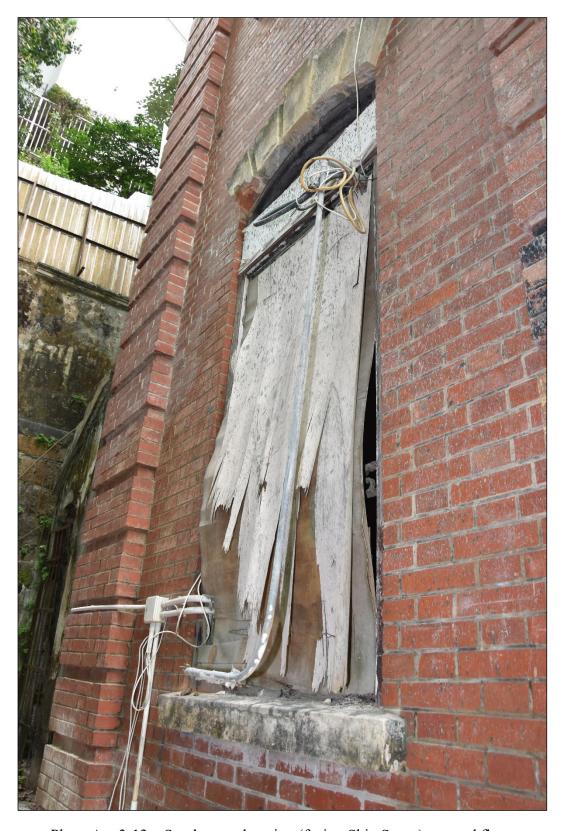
South-east elevation (facing Ship Street), ground floor, window Wdw-G09, external side, covered with plywood panel, (21st March, 2023)
